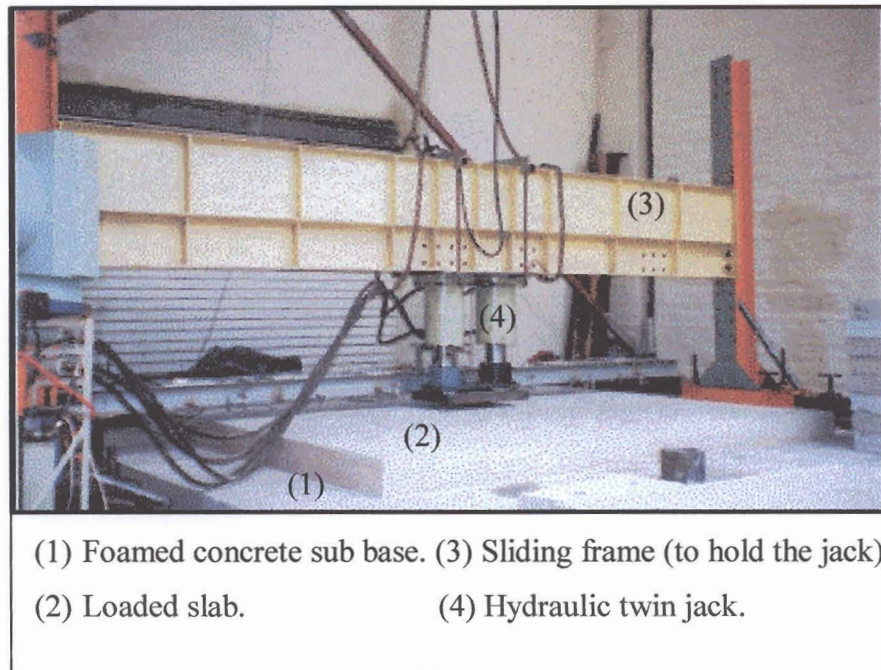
Photo Shows the General Test Setting: Full-scale Test (Interior load)
